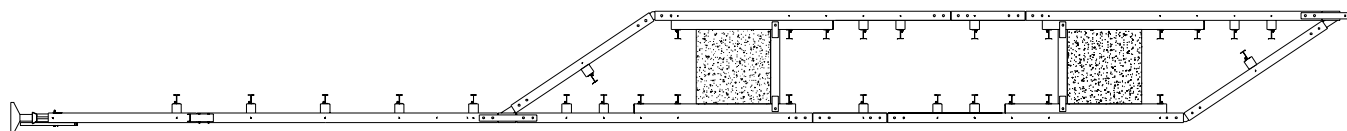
Schematic of the BEAT-BP Test Installation (Second Terminal Not Shown)
